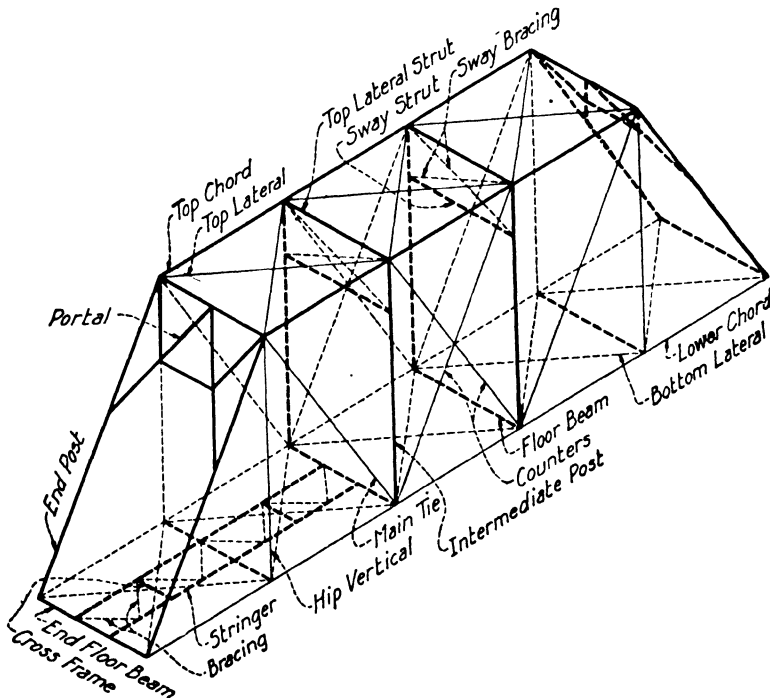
DIAGRAMMATIC SKETCH OF A RAILWAY TRUSS BRIDGE.
